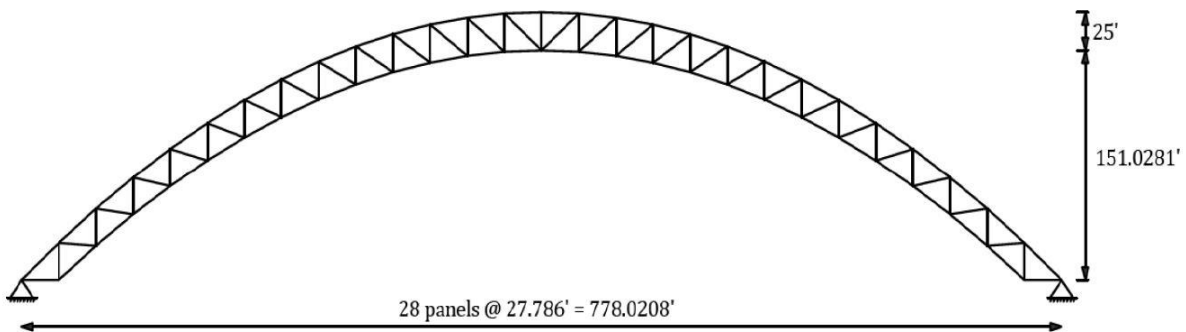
16 Elevation of West End-North Side Bridge (Makiabadi et al. 2013)
